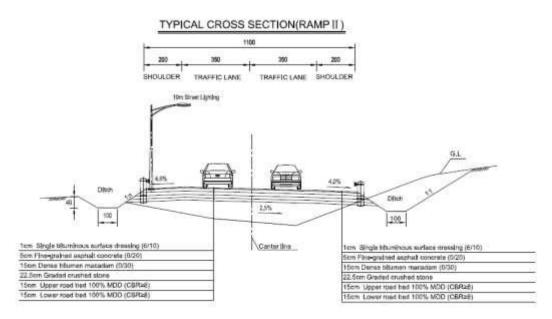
Typical Cross Section of Interchange Ramp(12m).
